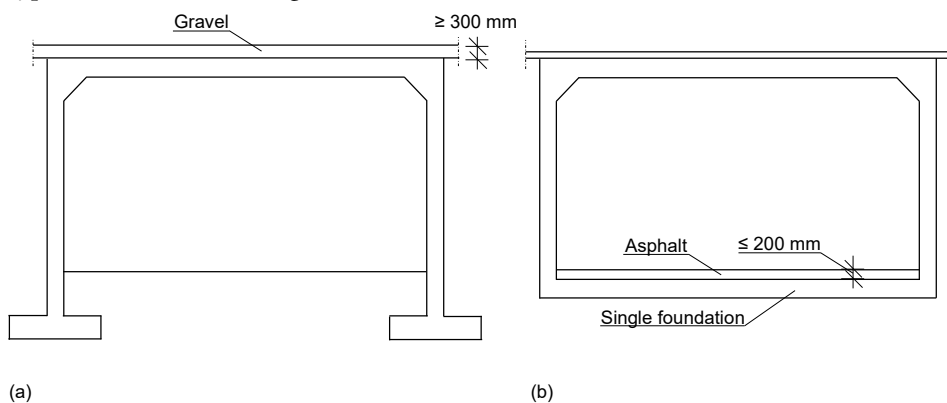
Illustrations of geometries where the special load cases regarding gravel on the bridge deck (a) and single foundation (b) are applicable.
